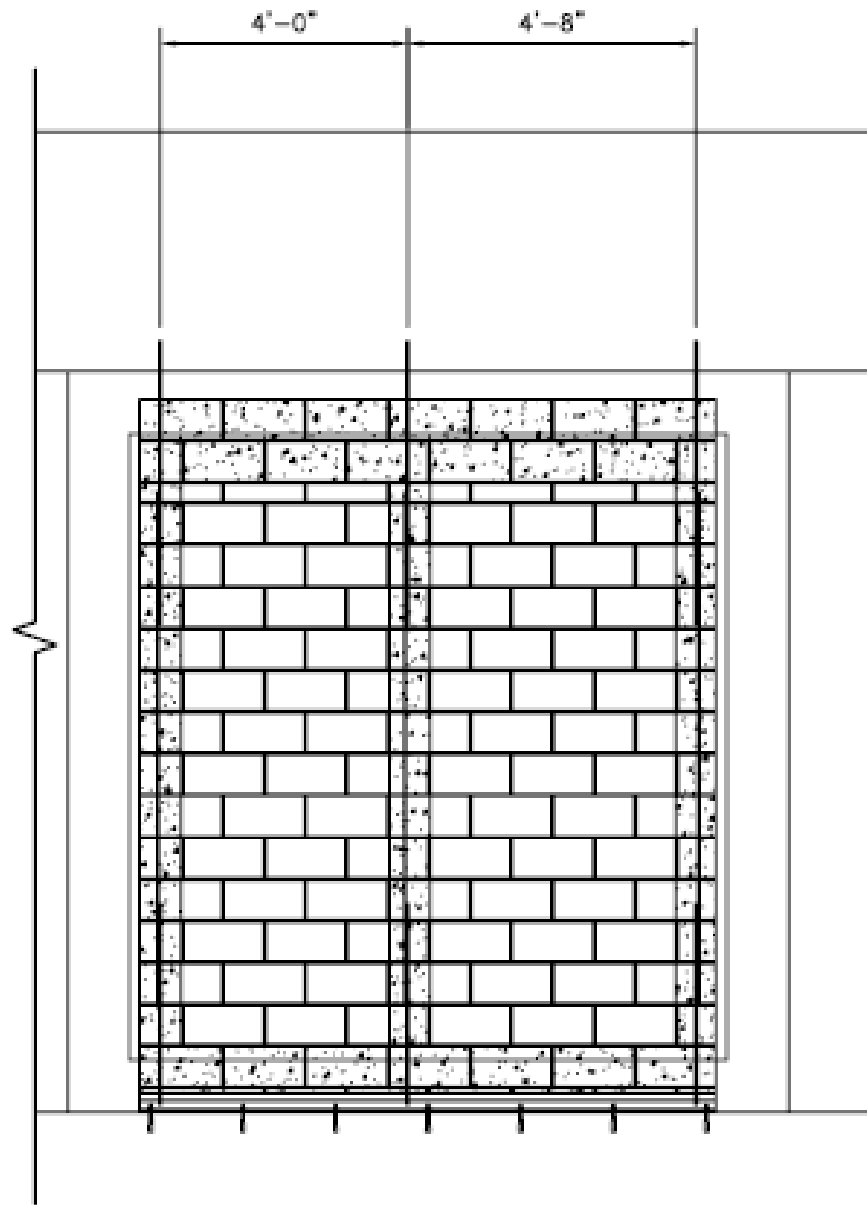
Front View Showing Rebar and Grouted Cell Locations for the 8-inch CMU Panel and Cavity Wall
